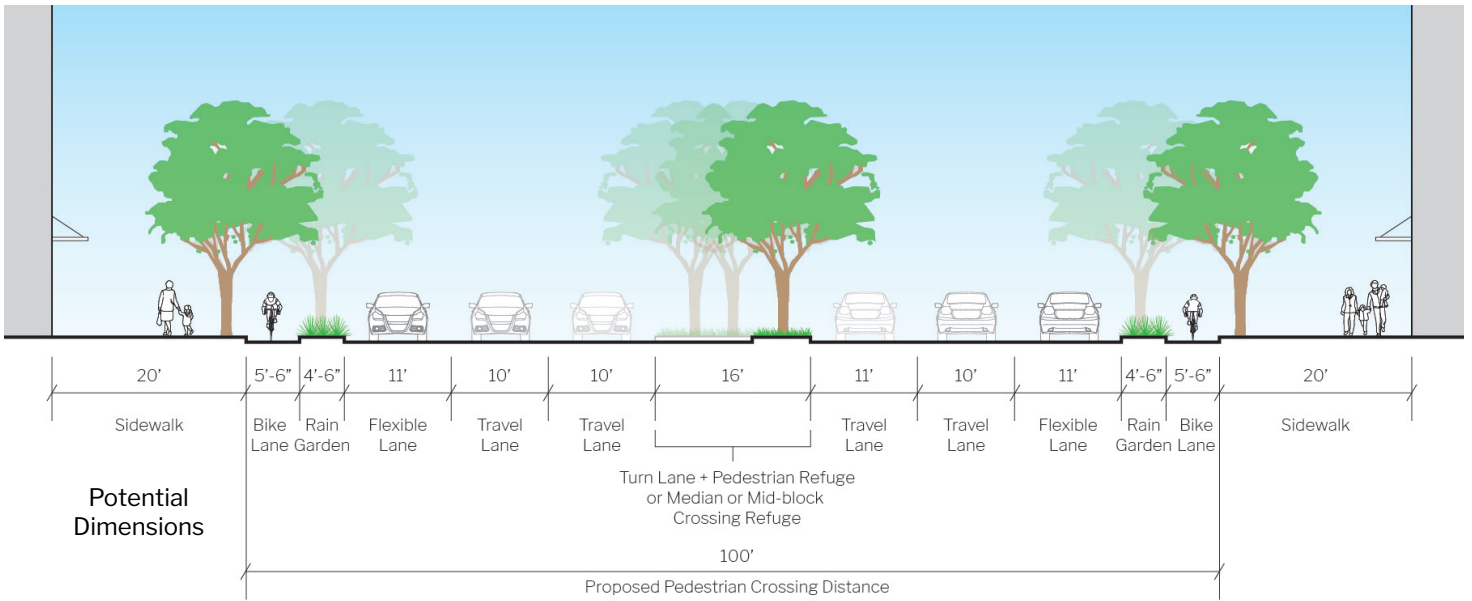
WINCHESTER BOULEVARD CONCEPT - 80 FOOT CURB-TO-CURB - PROPOSED STREET SECTION
